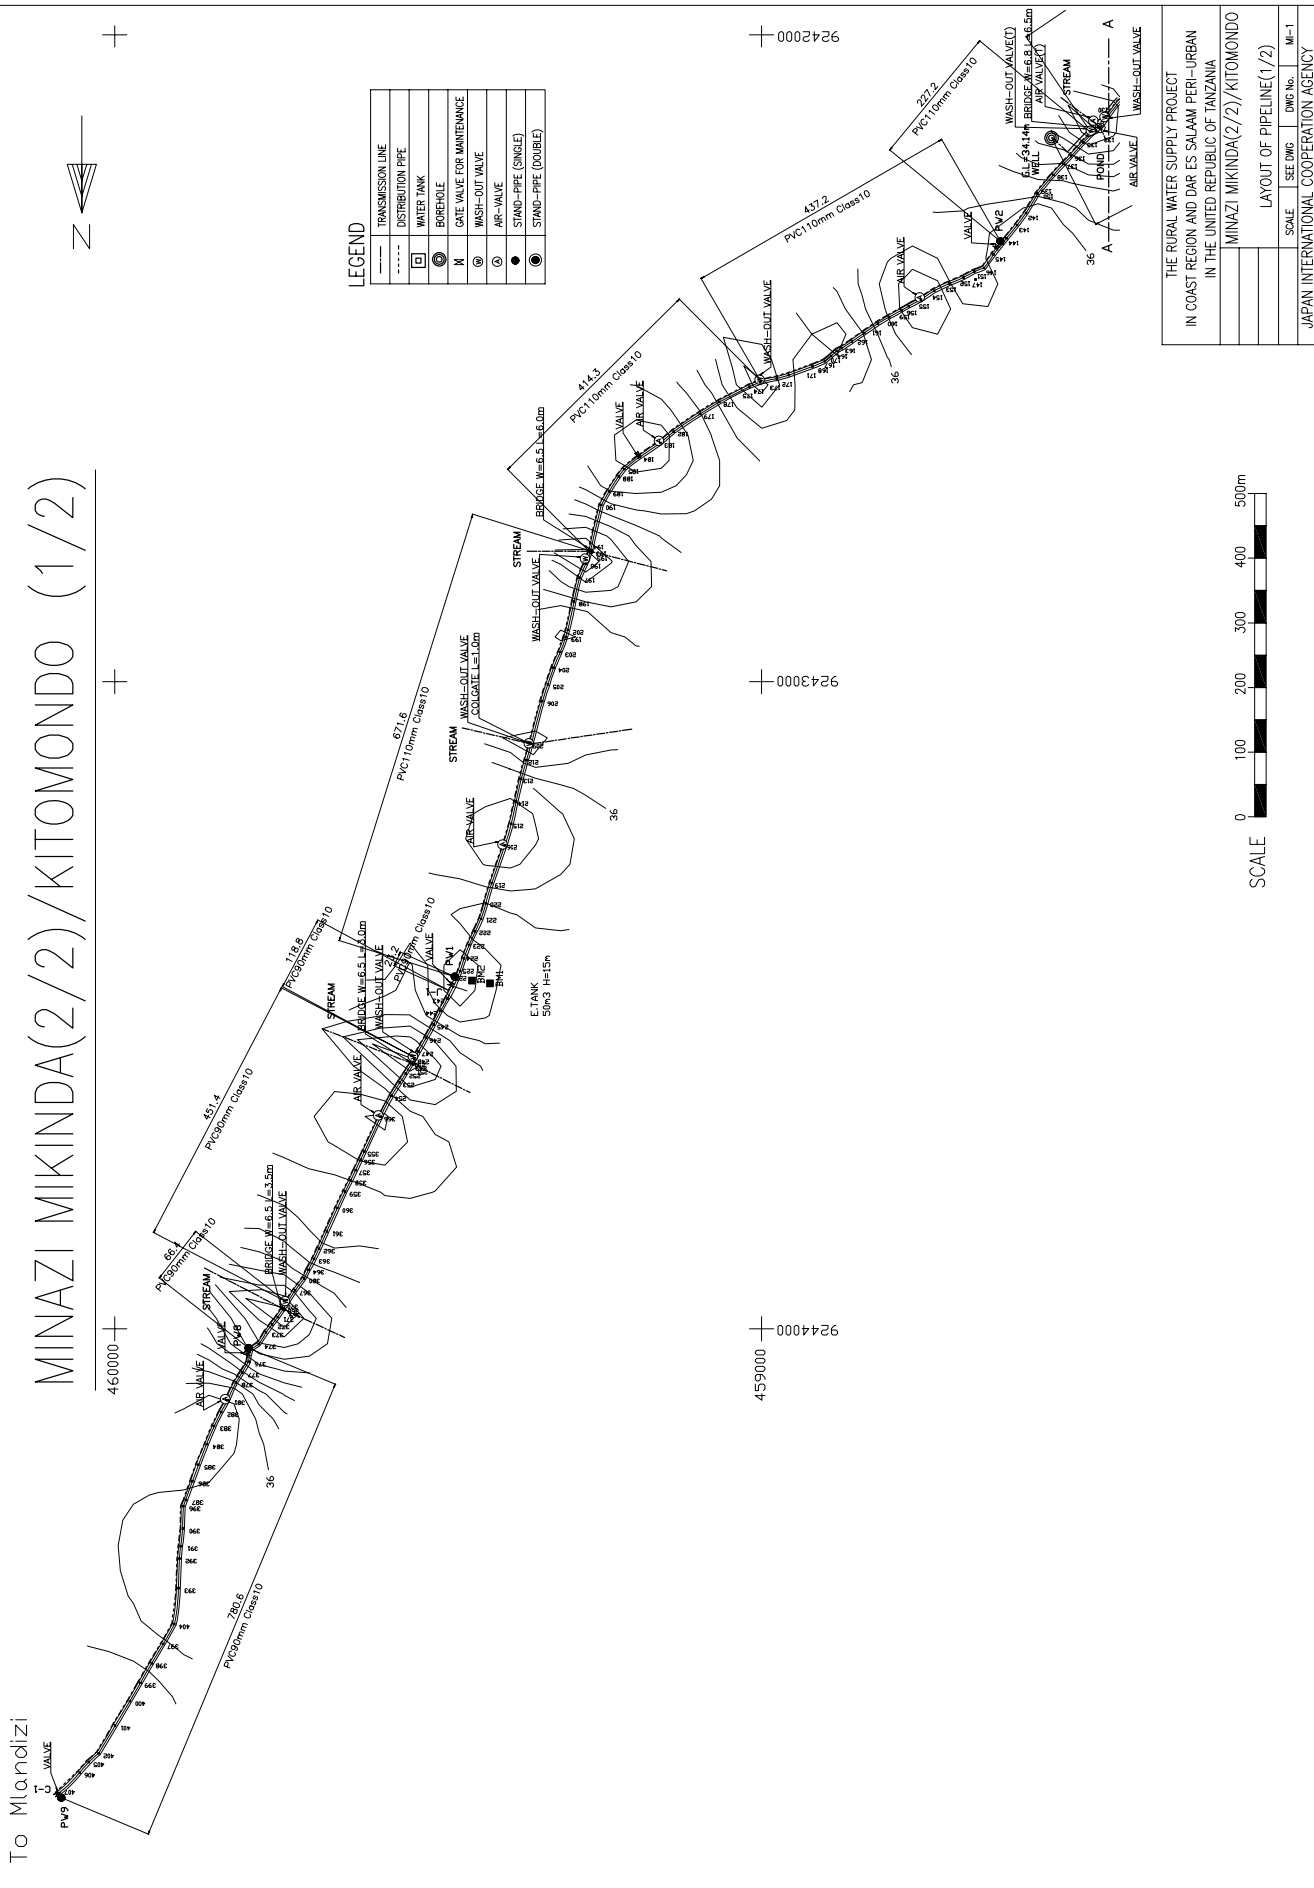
Layout Plan of Water Supply Facility (Minazi Mikinda (2/2)/Kitomondo)
